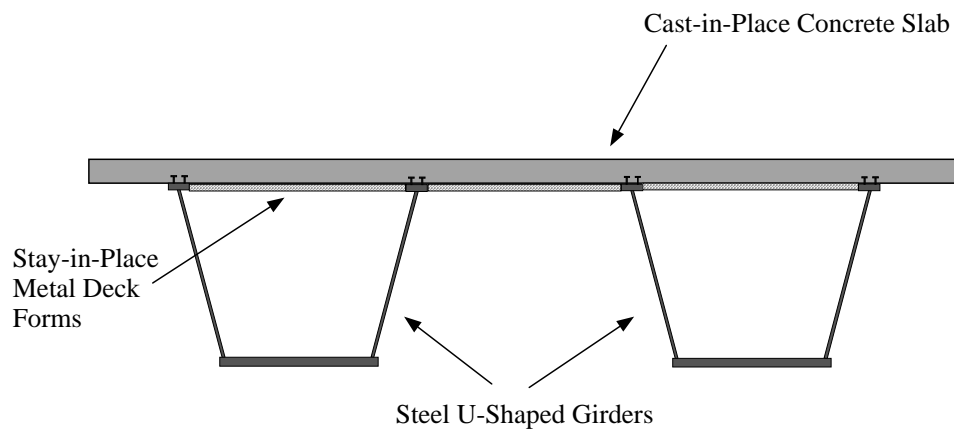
Cross-Section of Trapezoidal Box Girder System
